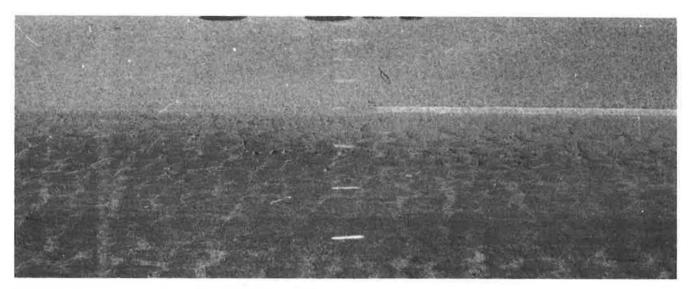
Typical fatigue-type cracking (after Hveem, 66).
